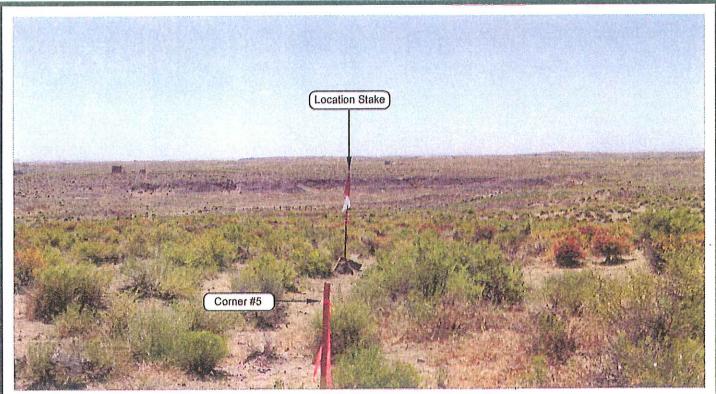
PHOTO VIEW: FROM CORNER #5 TO LOCATION STAKE
